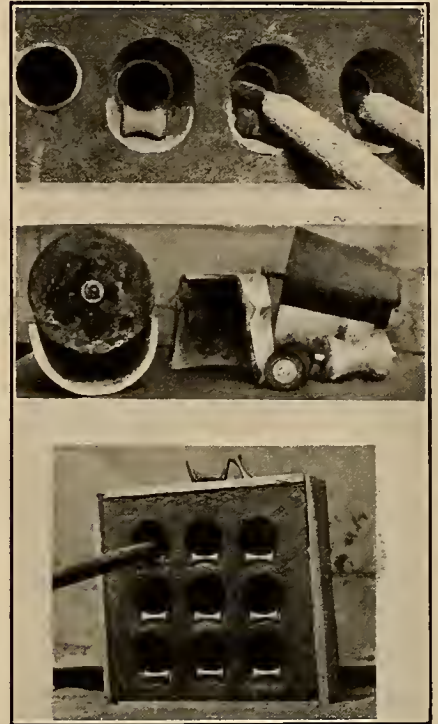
Typical examples of cast-in roller and support (above). (Center) Left—Circular wooden form and cast-iron roller support ready for mounting on manhole pouring form. Right—Another view of the equipment. (Below) Group installation.
